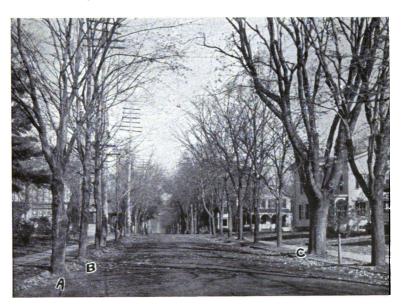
Street and Sidewalks Newly Made Without Destroying Old Trees.
